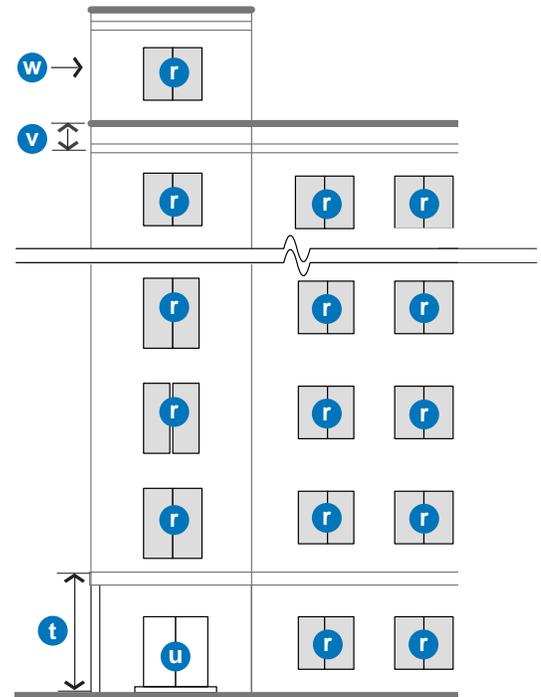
(3). General Stoop Building: Street Facade Requirements.
